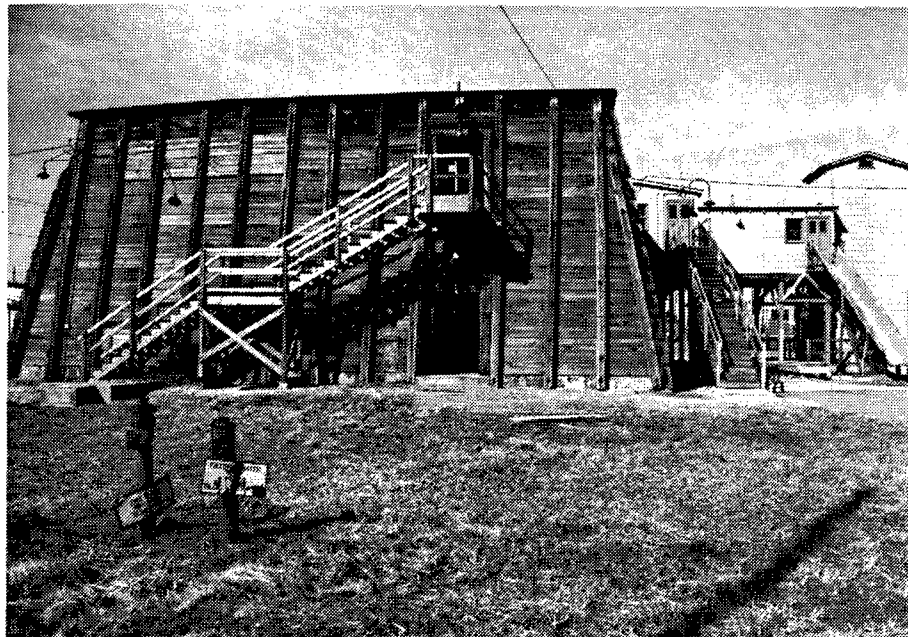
Building 4909-3: A different structural design of a Solvent Recovery House. A road runs between the barricaded Solvent Recovery House and its Elevator/Stair Building.
